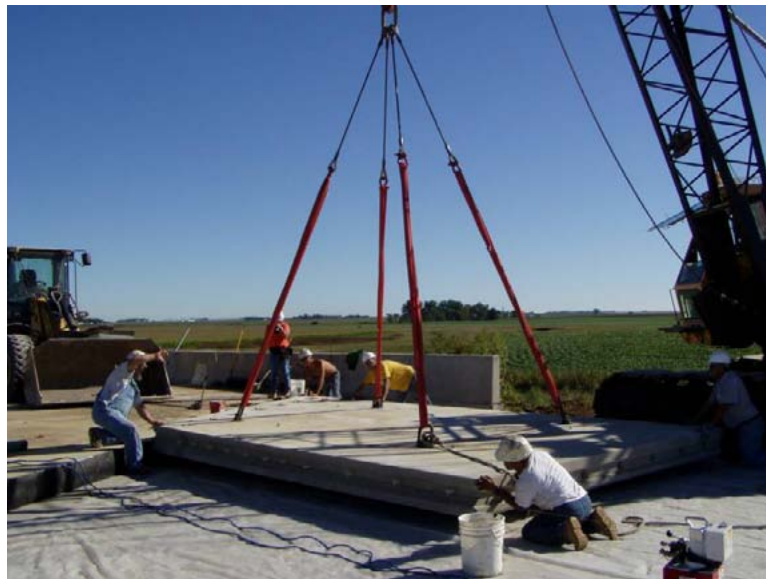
Photo. Installation of Panel 1A at the south bridge abutment.
